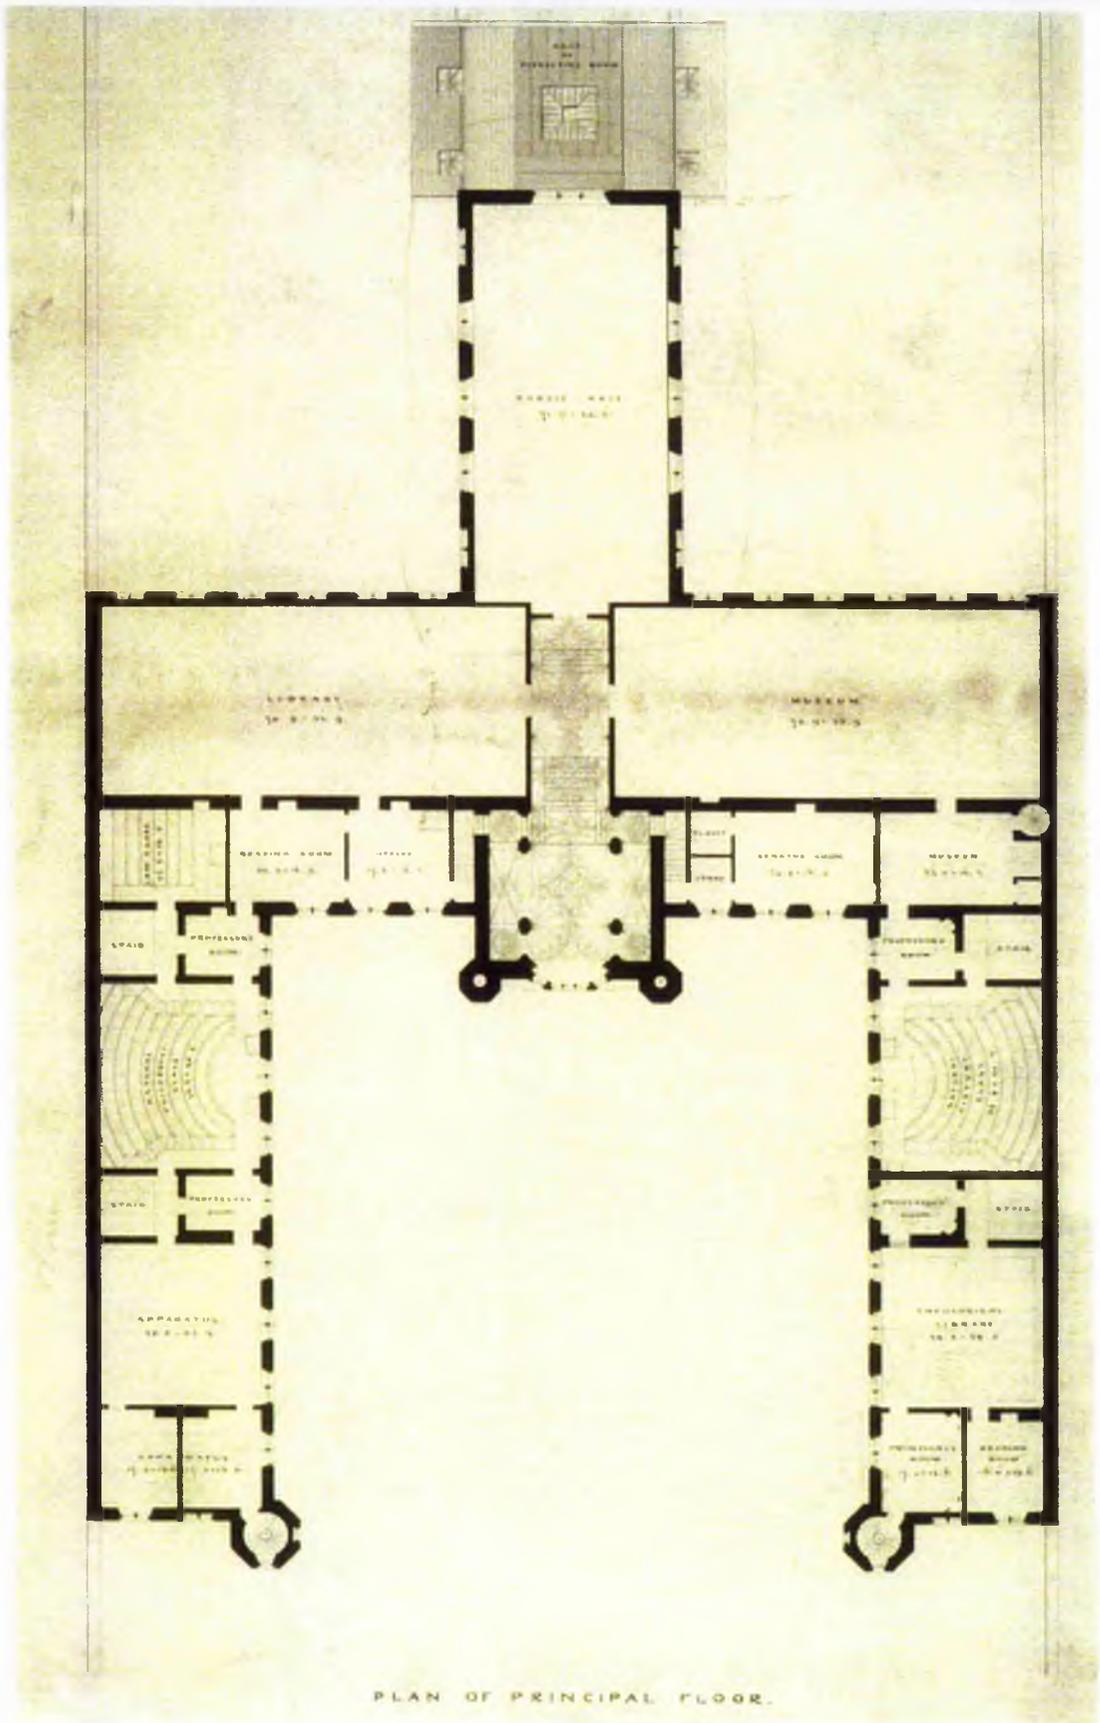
Marischal College. Principal floor plan. A. Simpson, June, 1836.
